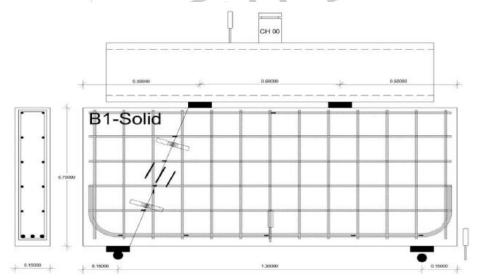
Geometry, Loading, and Reinforcement of Beam (B1) Tested in laboratory
